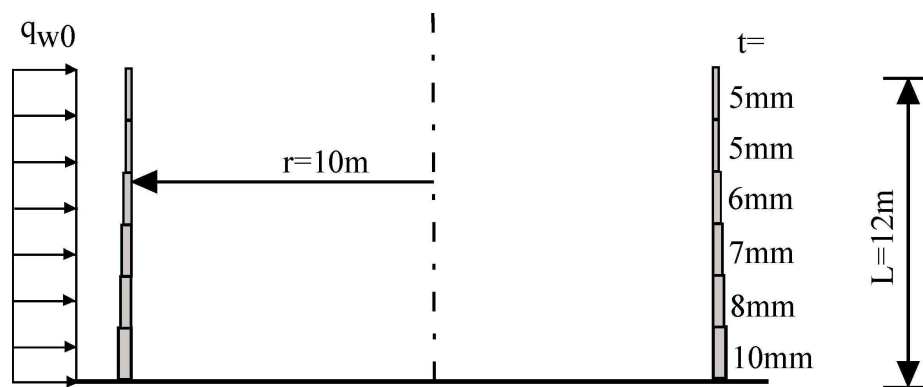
Typical example of tank structure (taken from ECCS EDR5, 2008)
